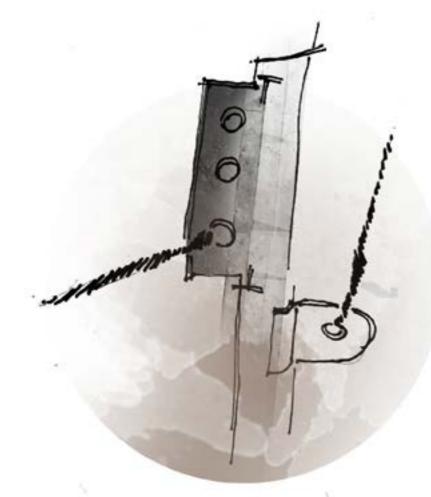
F: Architectural approach to joints (Author, 2021)
